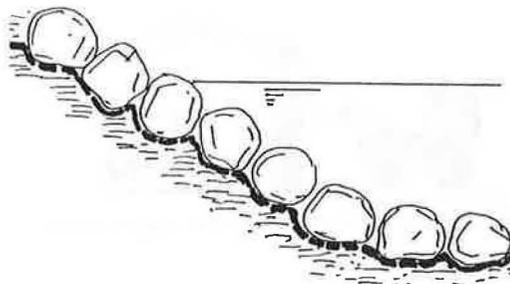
Geotextile adapting to armour and soil (SVG 1992)
